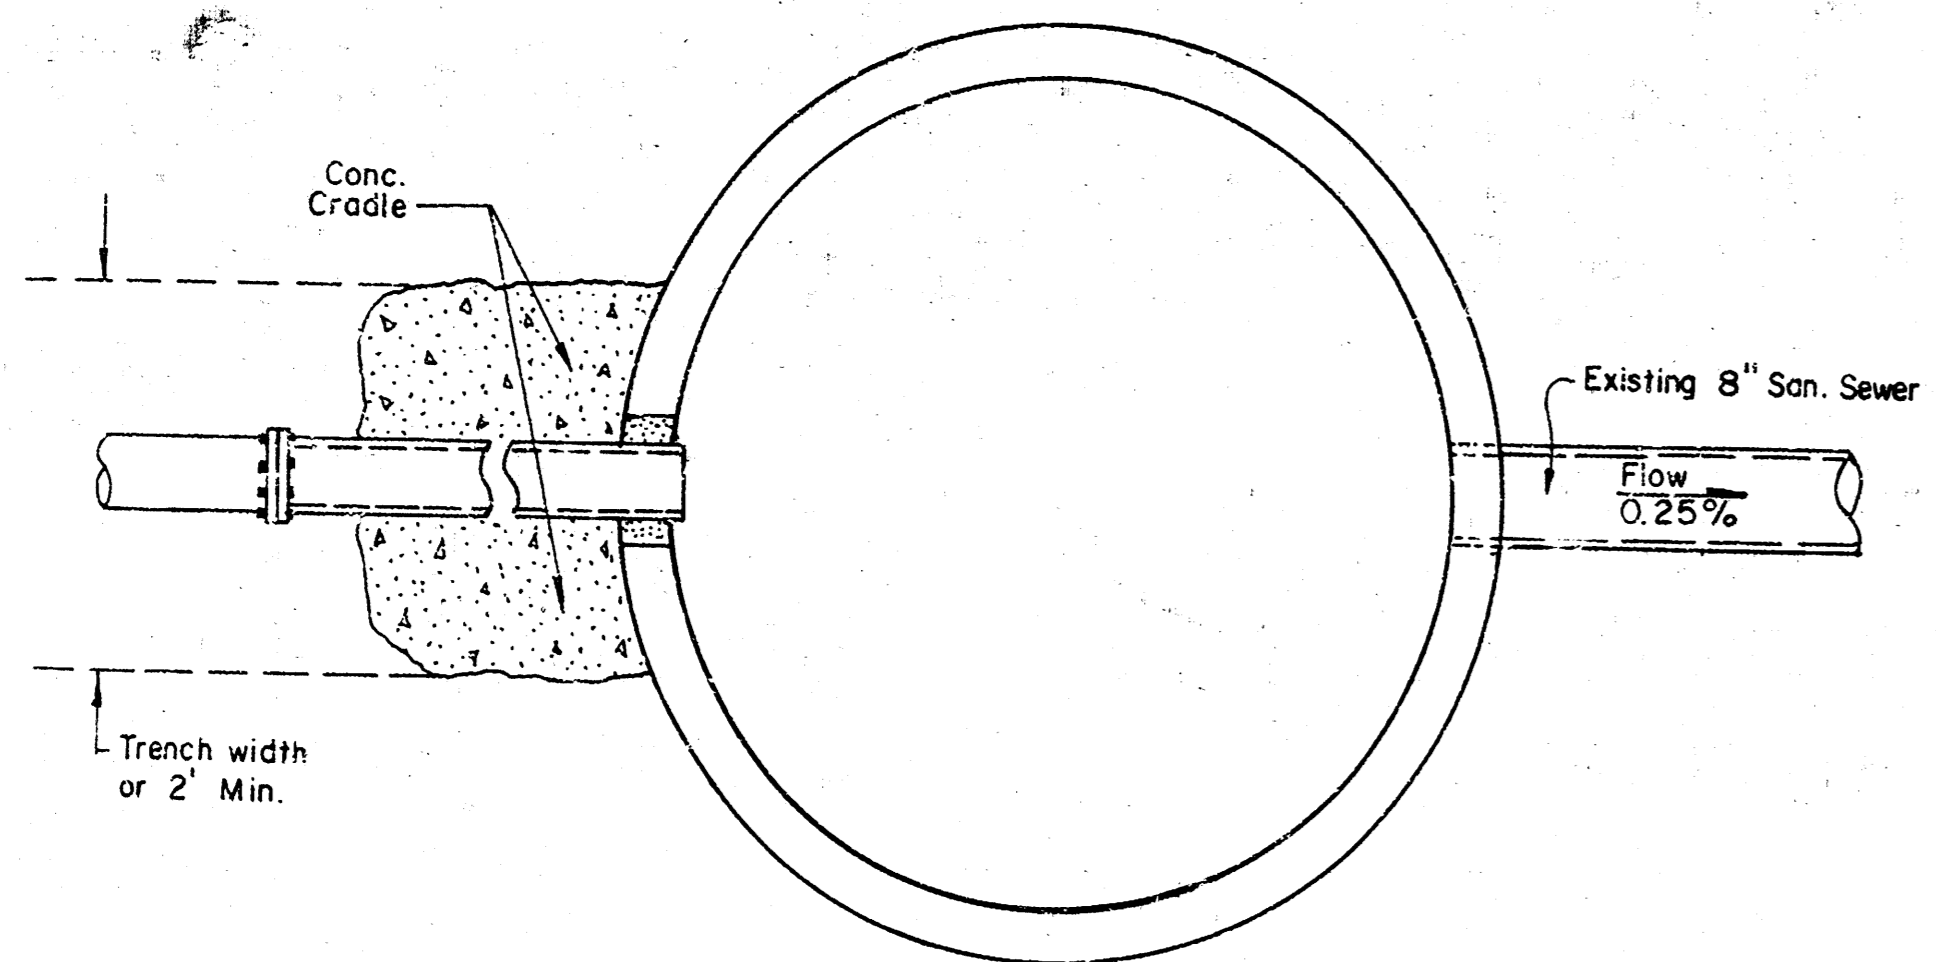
PLATE IN SINGLE PLAN AND PROFILE ELEVATION
